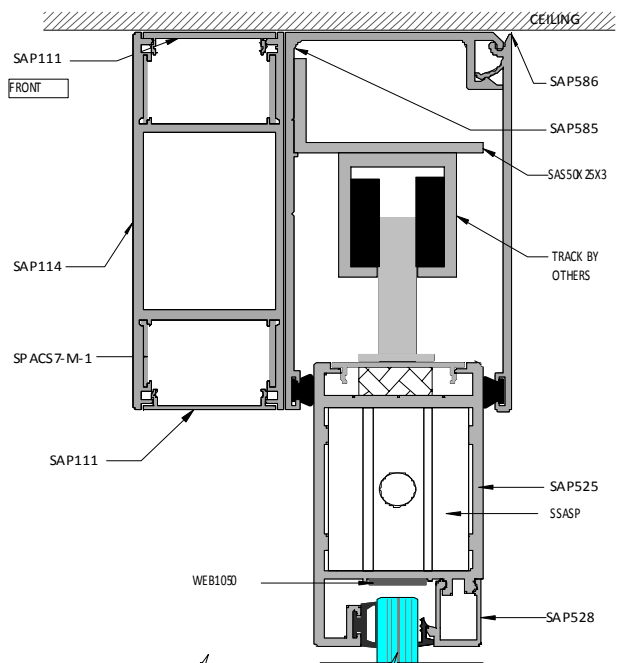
DETAIL FOR OPENINGS LESS THAN 3.6 METRES WIDE AND LESS THAN 2.8MTRS HIGH
